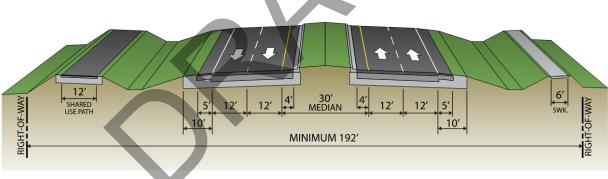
Proposed Suburban Typical Section Stacy Road to SR 56
